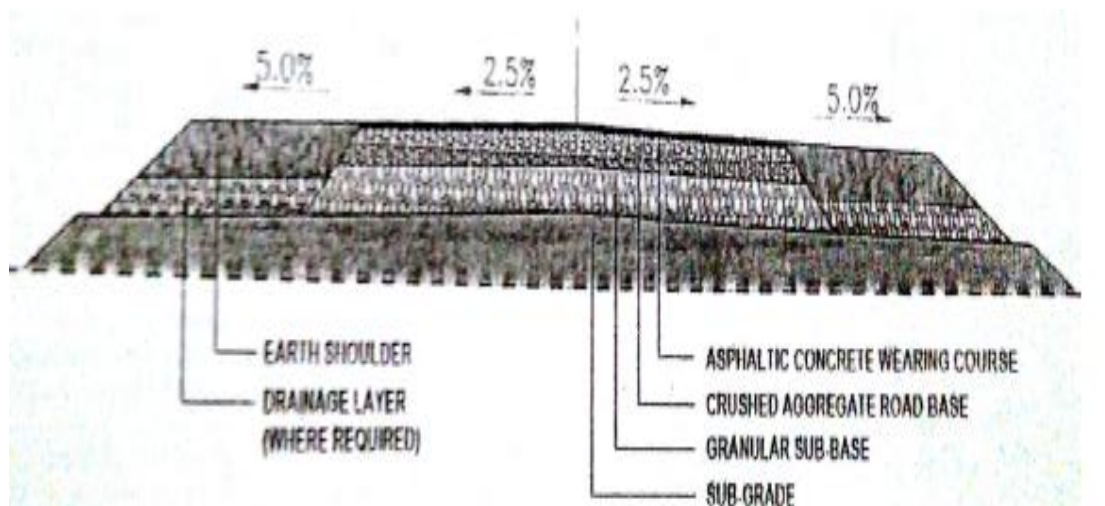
Typical Pavement Cross Section of a Low Volume Rural Road (JKR, 2015)
